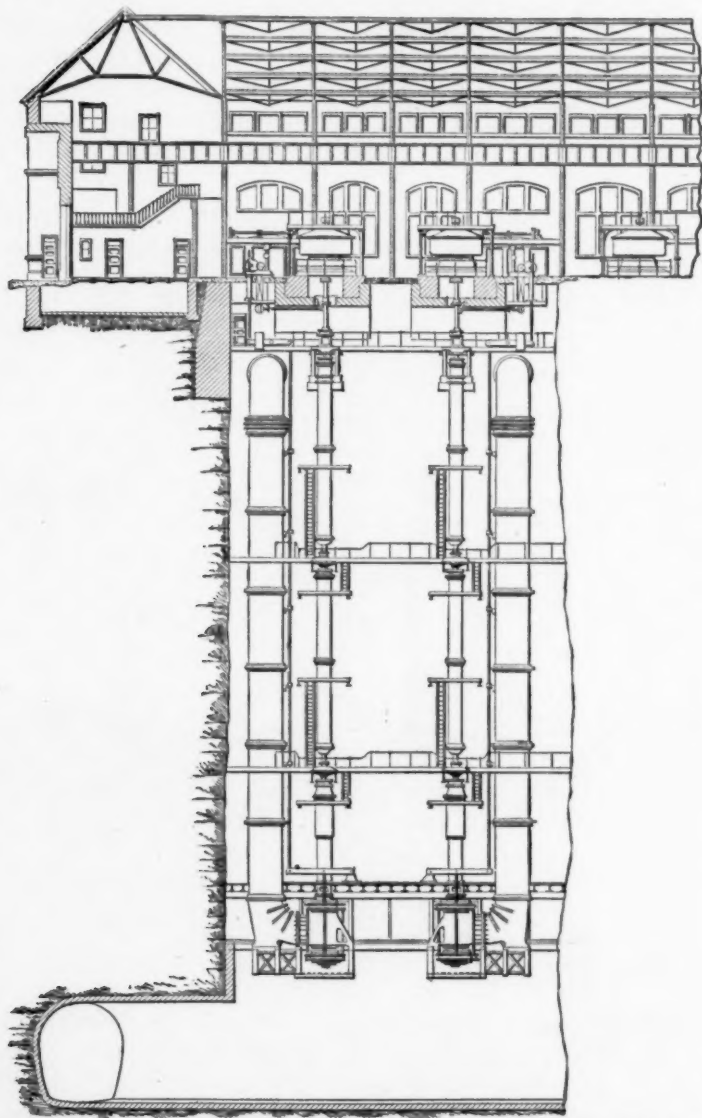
PARTIAL LONGITUDINAL SECTION OF THE POWER HOUSE AND WHEEL-PIT.
